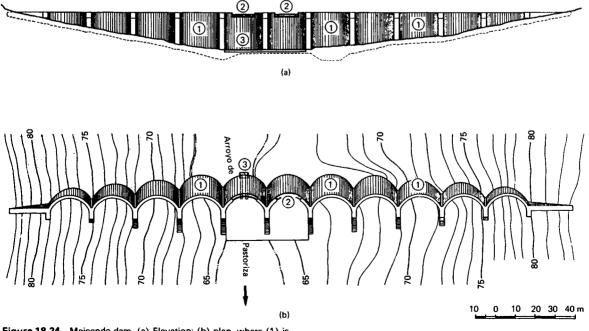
Meicende dam. (a) Elevation; (b) plan, where (1) is an arch, (2) are spillways, and (3) is the intake
